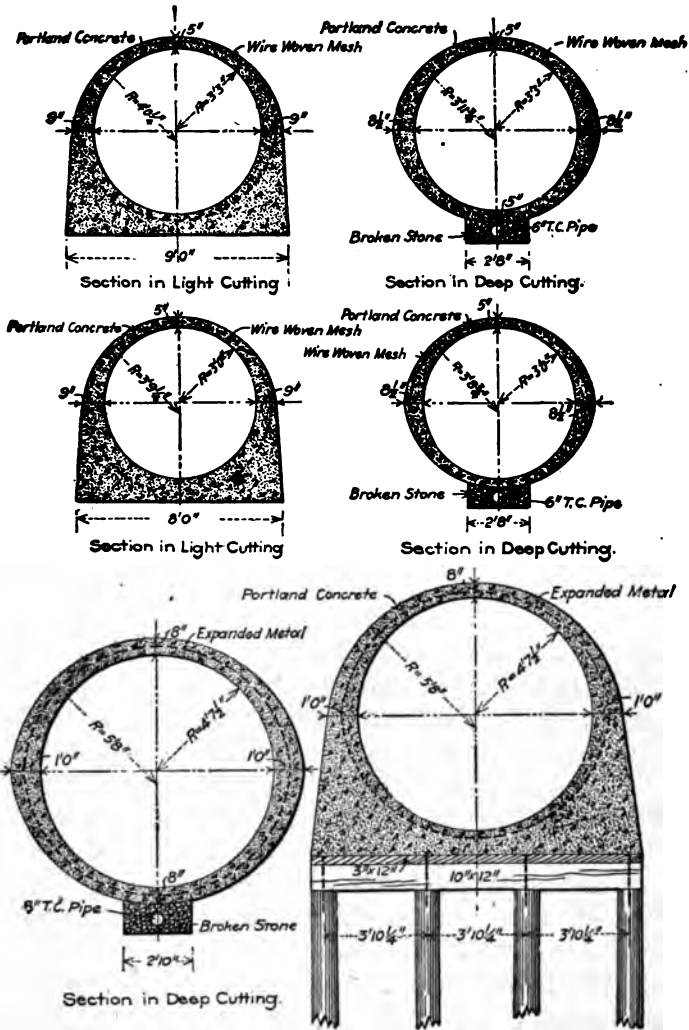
Price's Run Sewer, Wilmington, Delaware.
